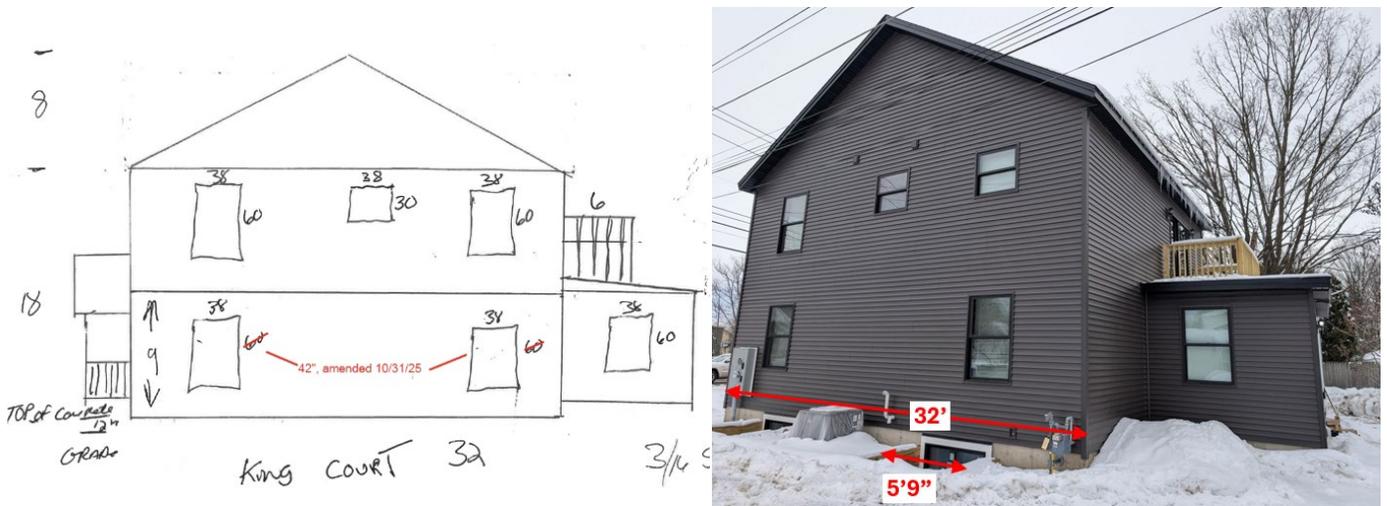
East elevation. Left: Submitted site plan; Right: As-Built Photograph.
